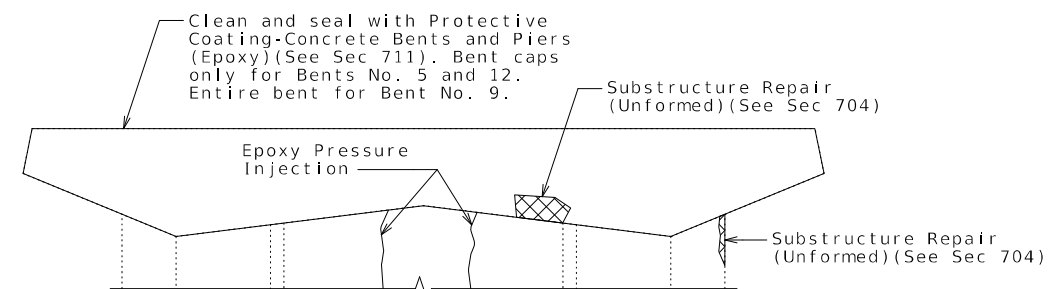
DETAIL SHOWING SUBSTRUCTURE REPAIR AT END BENT NO. 15
